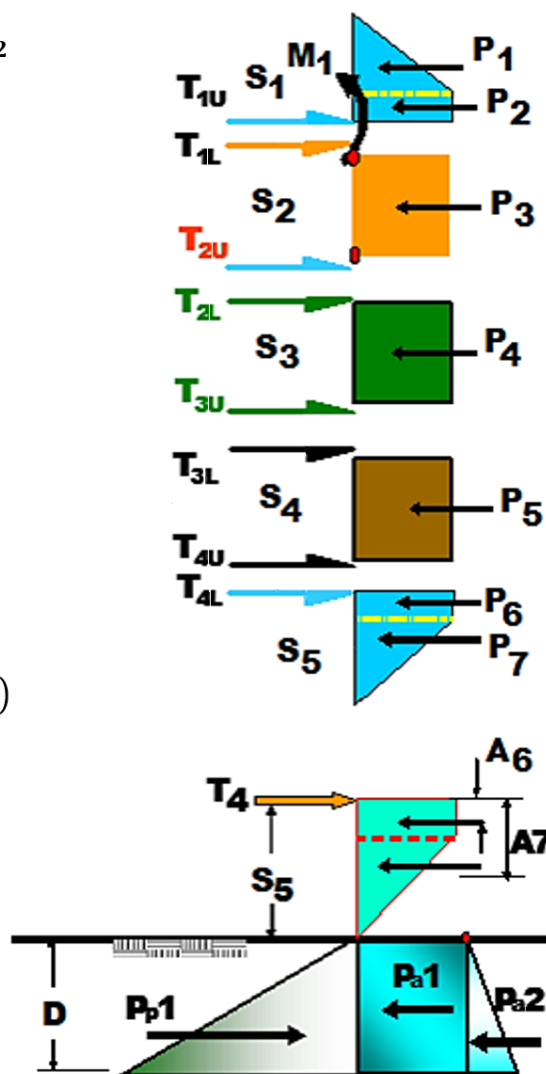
Detailed Analysis of Multi Ground Anchor Wall
